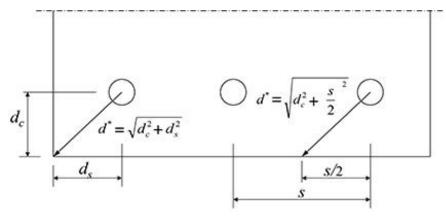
Determination of crack spacing to Frosch crack model (Frosch, 2014)
